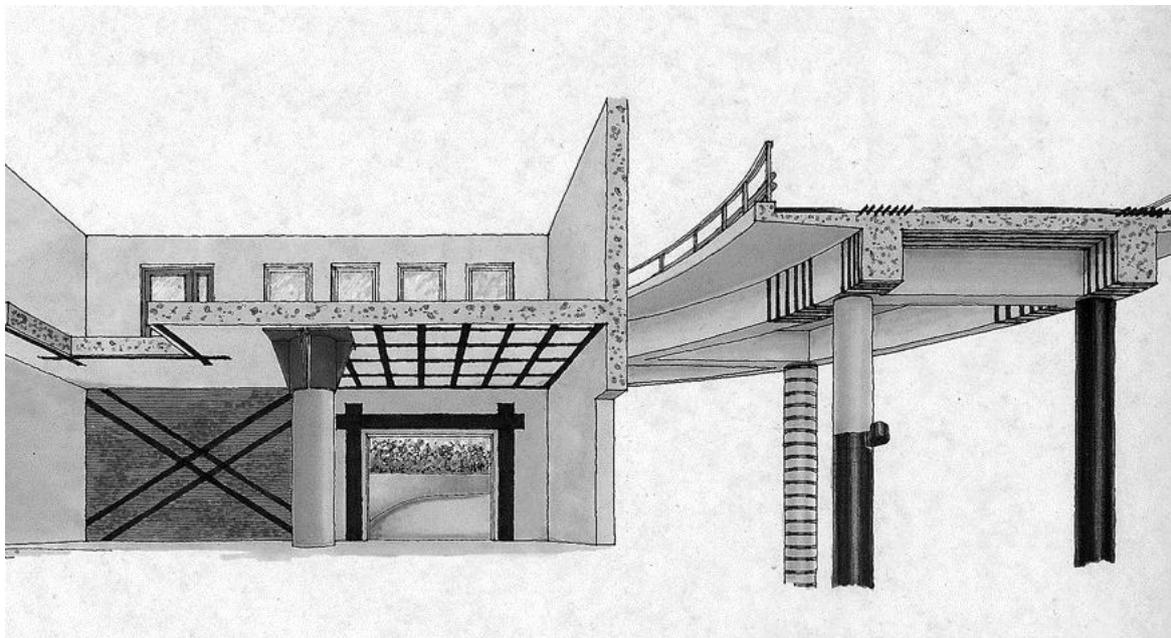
Strengthening possibilities with plates, sheets and NSM.
